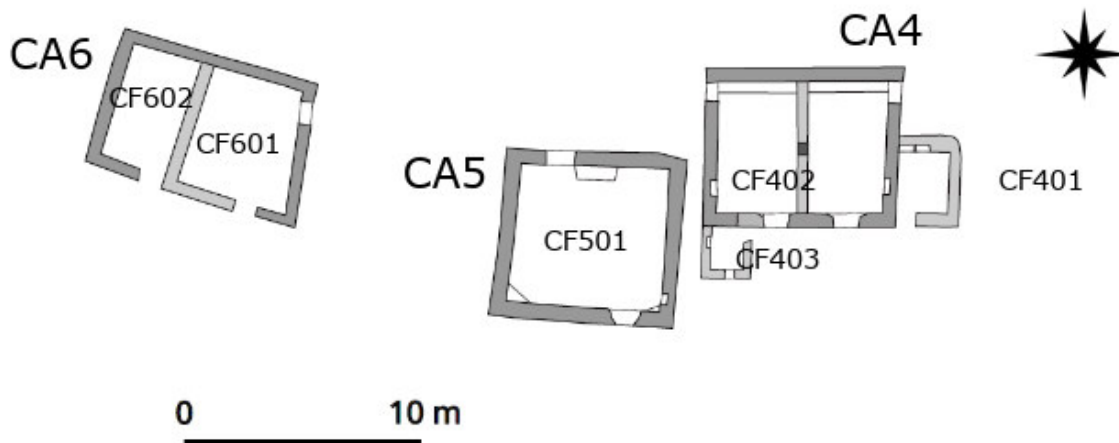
Plan of the building complexes identified at UT722. Bizzarri, 2023.
